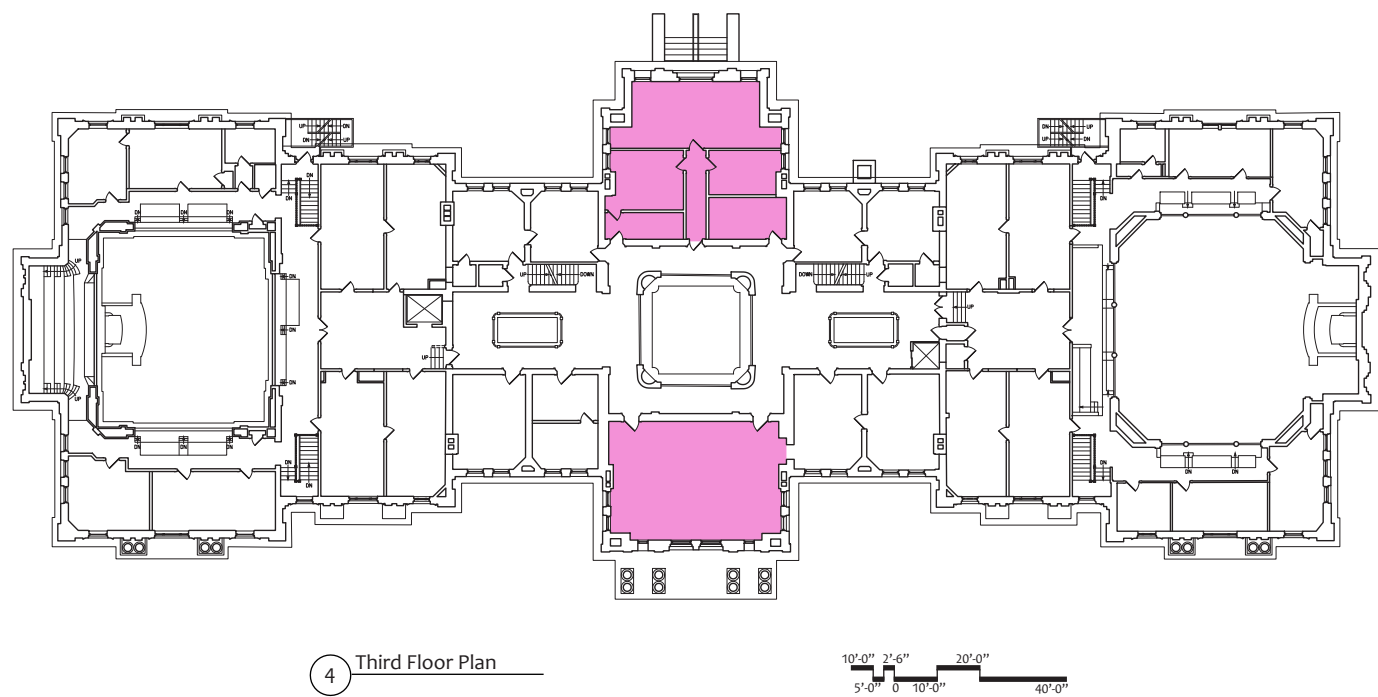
Third Floor Plan of Committee Rooms [highlighted in pink]
